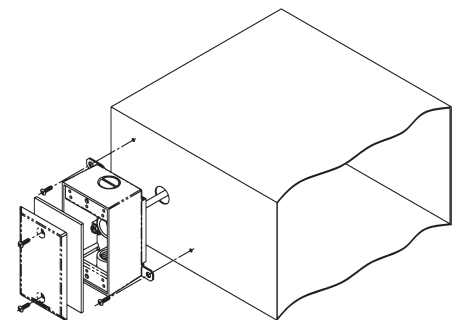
BAPI-Box (BB) Mounting Holes, Rotate Holes 90° for Horizontal Mounting
